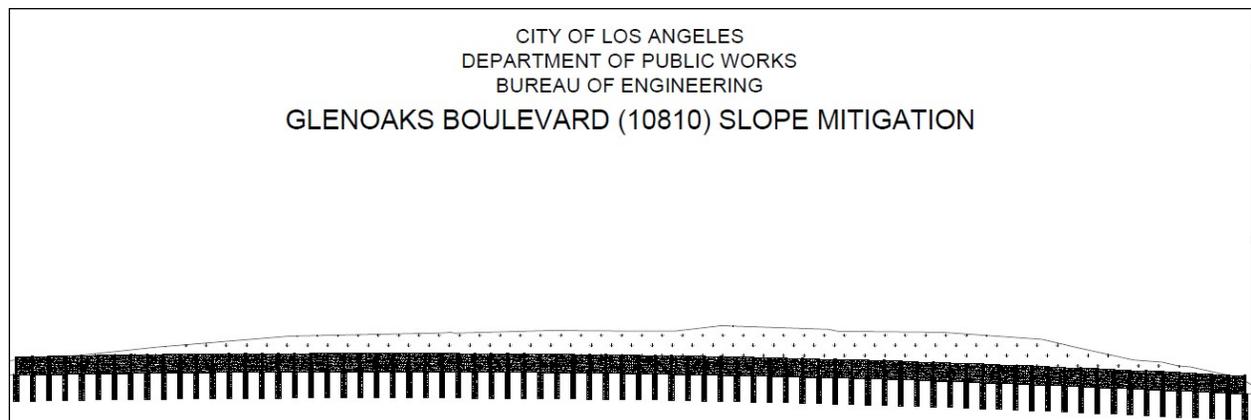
Glenoaks Boulevard (10810) Bulkhead Elevation View.
